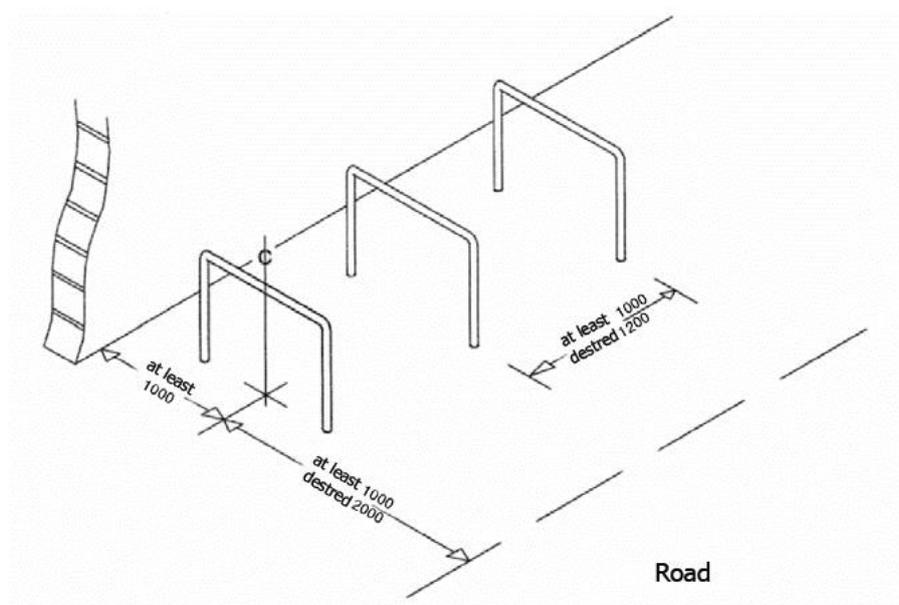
U-shaped rack located at 90 degrees to the wall and the road
